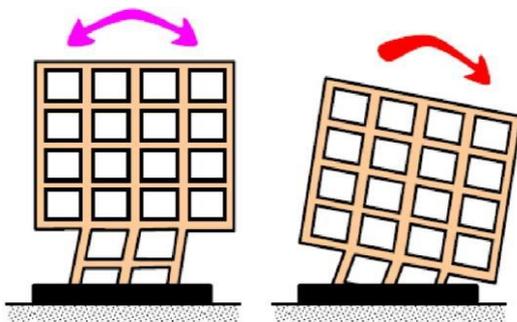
Buildings with floating columns: Overloading of columns in ground storey cause failure of buildings with floating columns during strong earthquake shaking.
